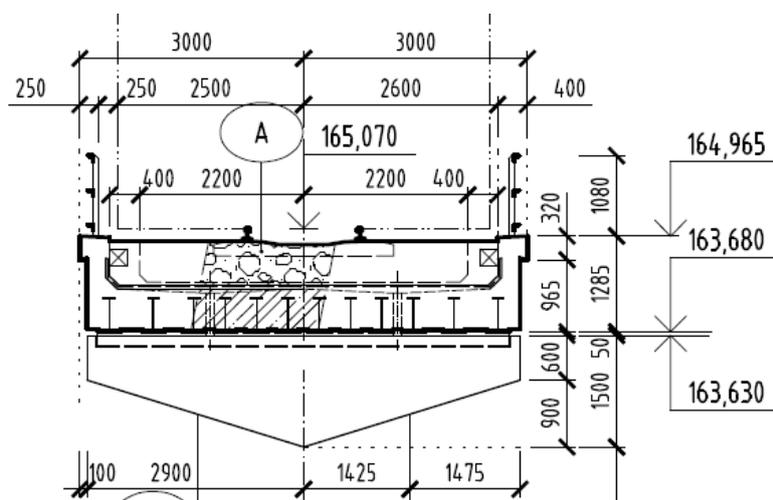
Cross-profile of the Hodonín–Holíč railway bridge
